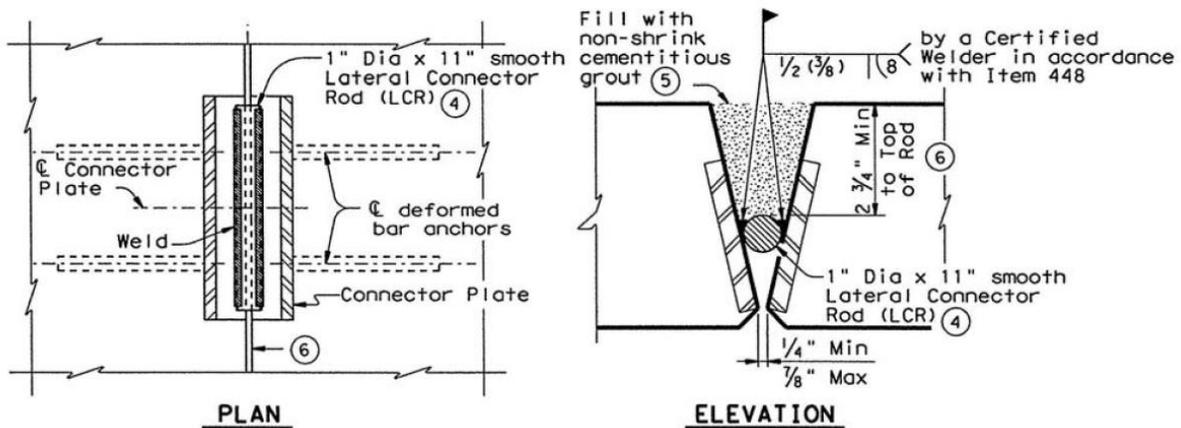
9 Lateral Welded Plate Beam Connection Details [8].
